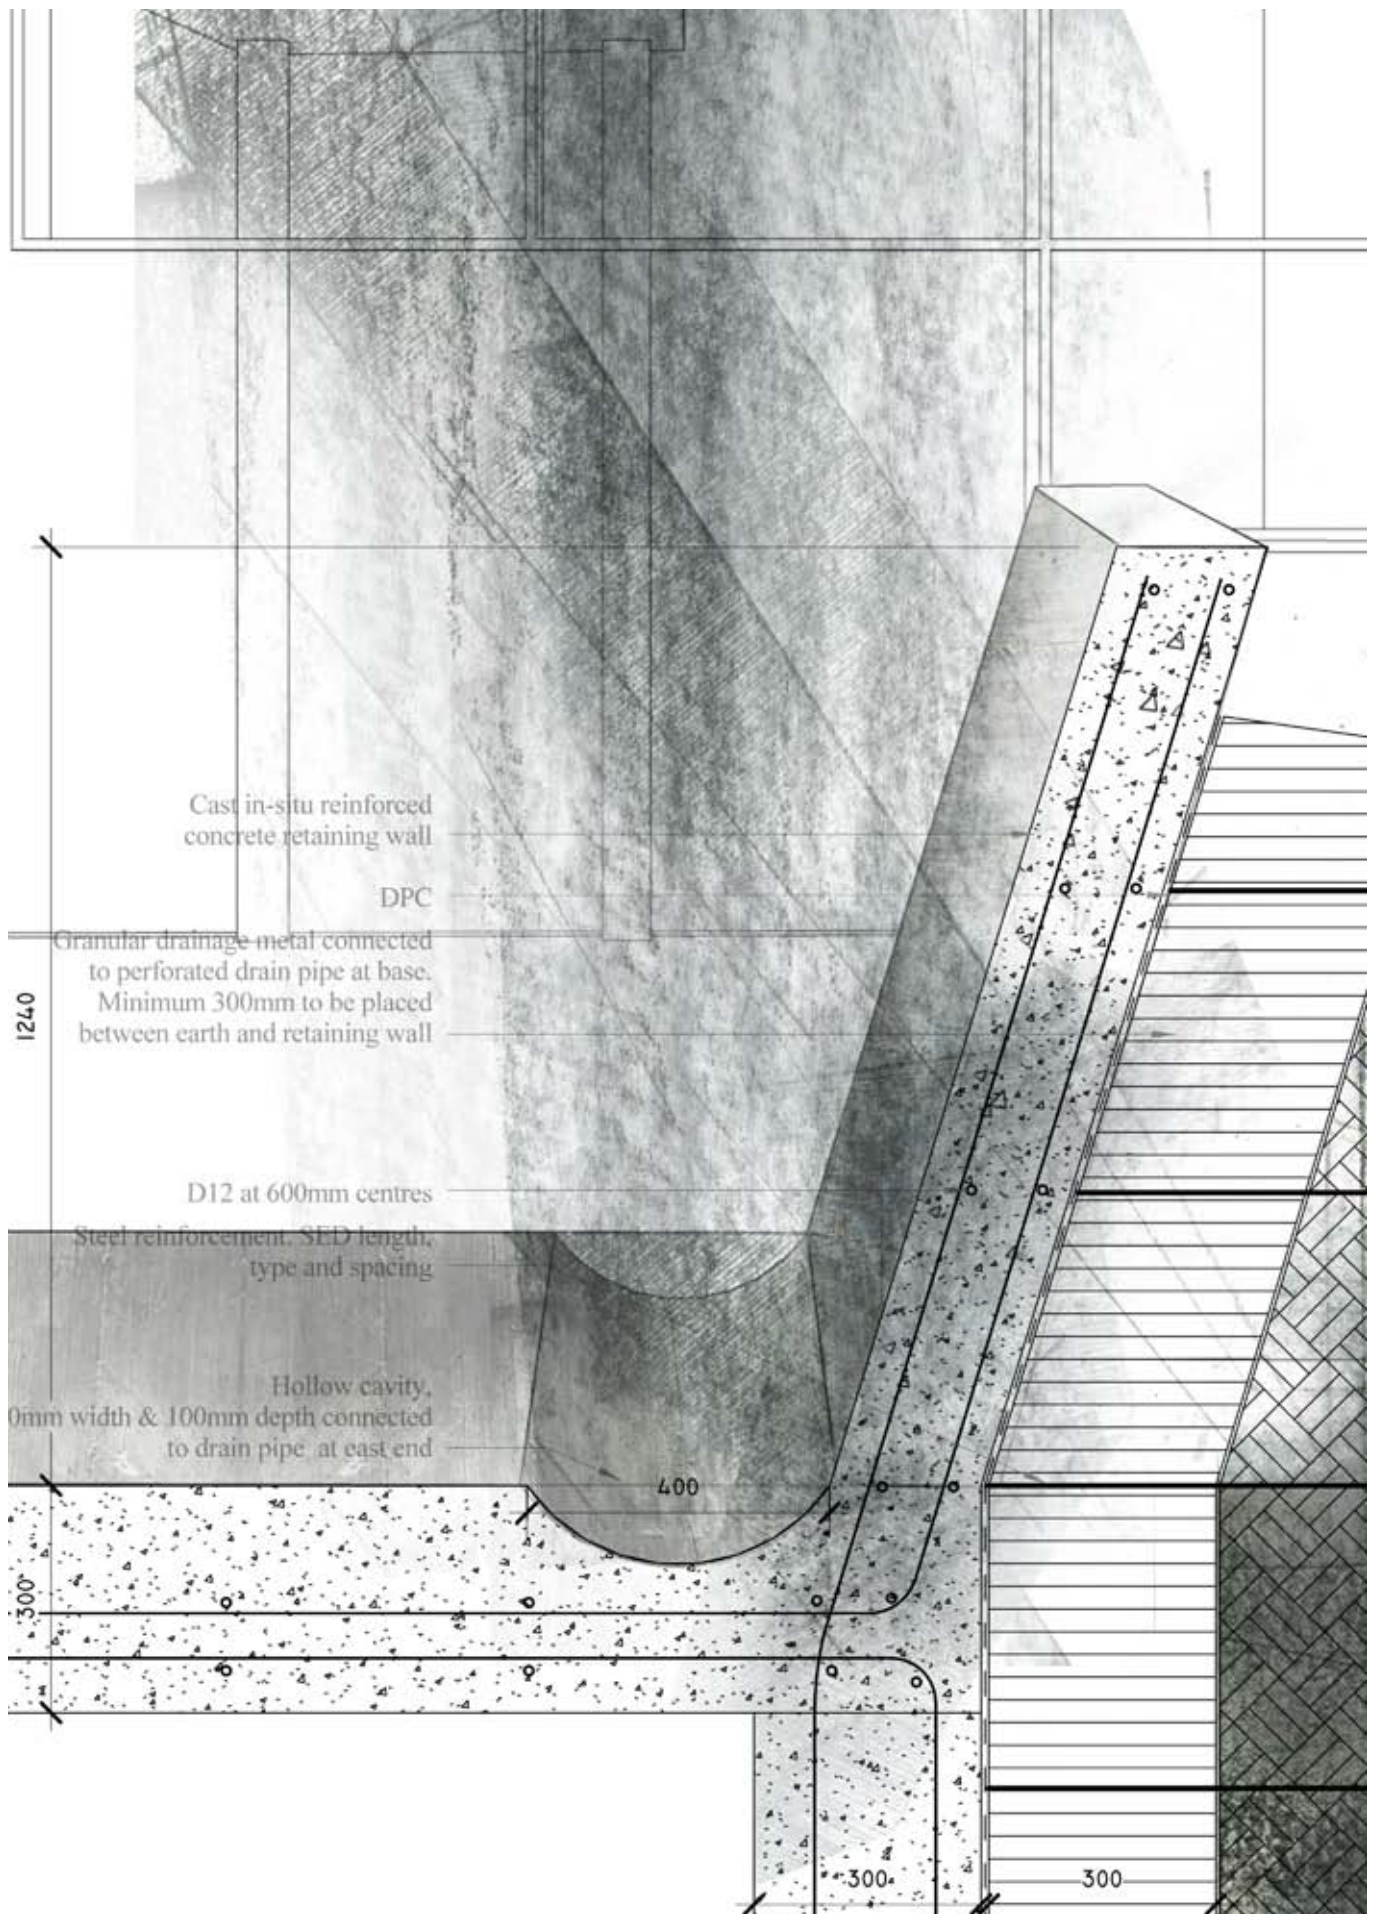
Detail VII (1:10). Upper floor retaining wall at rear of stair landing that enables public/private blurring between users and southern neighbours, and the collection and trace of rain water in poor weather. Created by Author. Hand and digitally composed.
